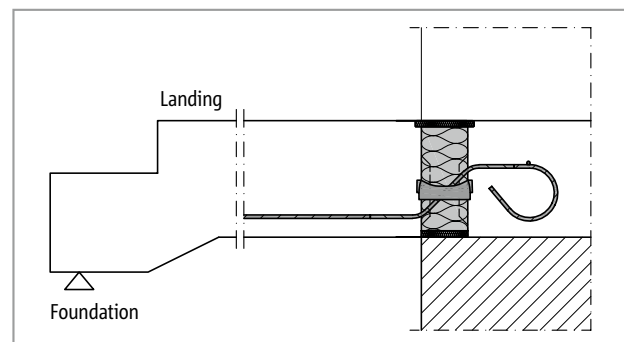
Schöck Isokorb® T type Q: Connection stair flight with thermal insulating cavity masonry (e.g. T type Q-V1 to T type Q-V5)
